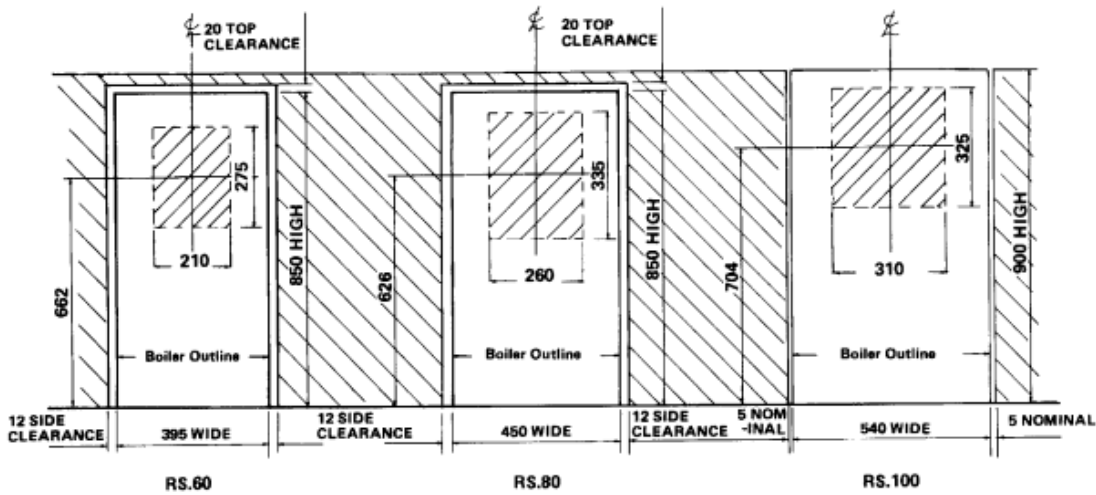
FLUE HOLE POSITIONS AND BOILER CLEARANCES
